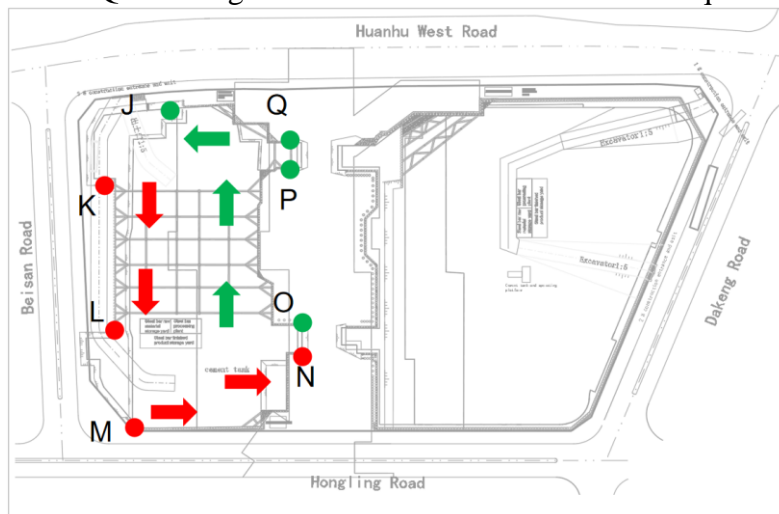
Construction Sequence of 4# Basement Foundation Pit Support
